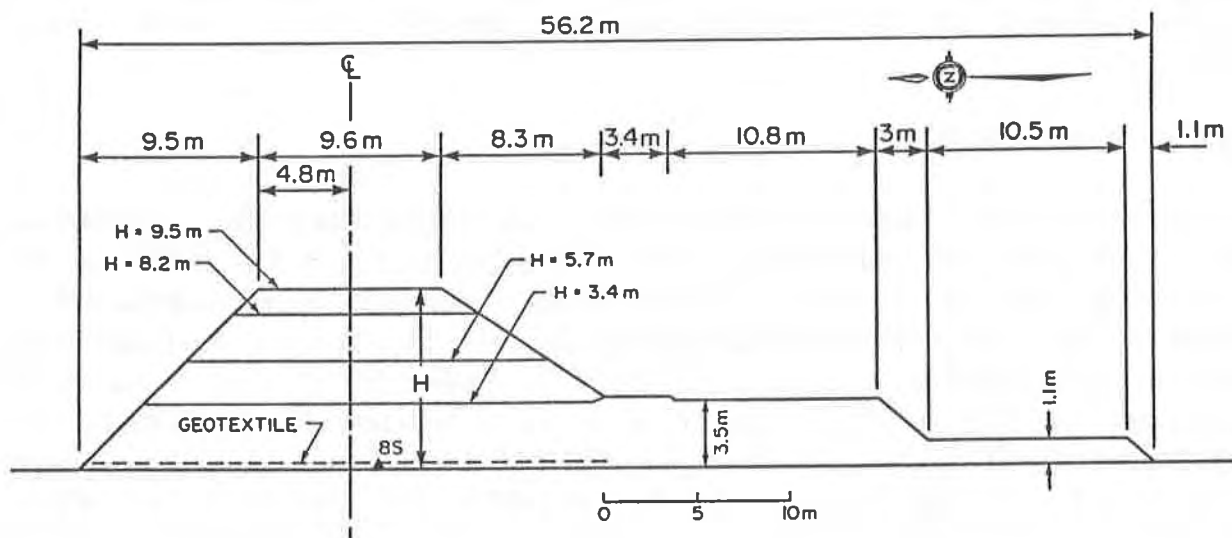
THE CROSS SECTION OF THE TEST EMBANKMENT
